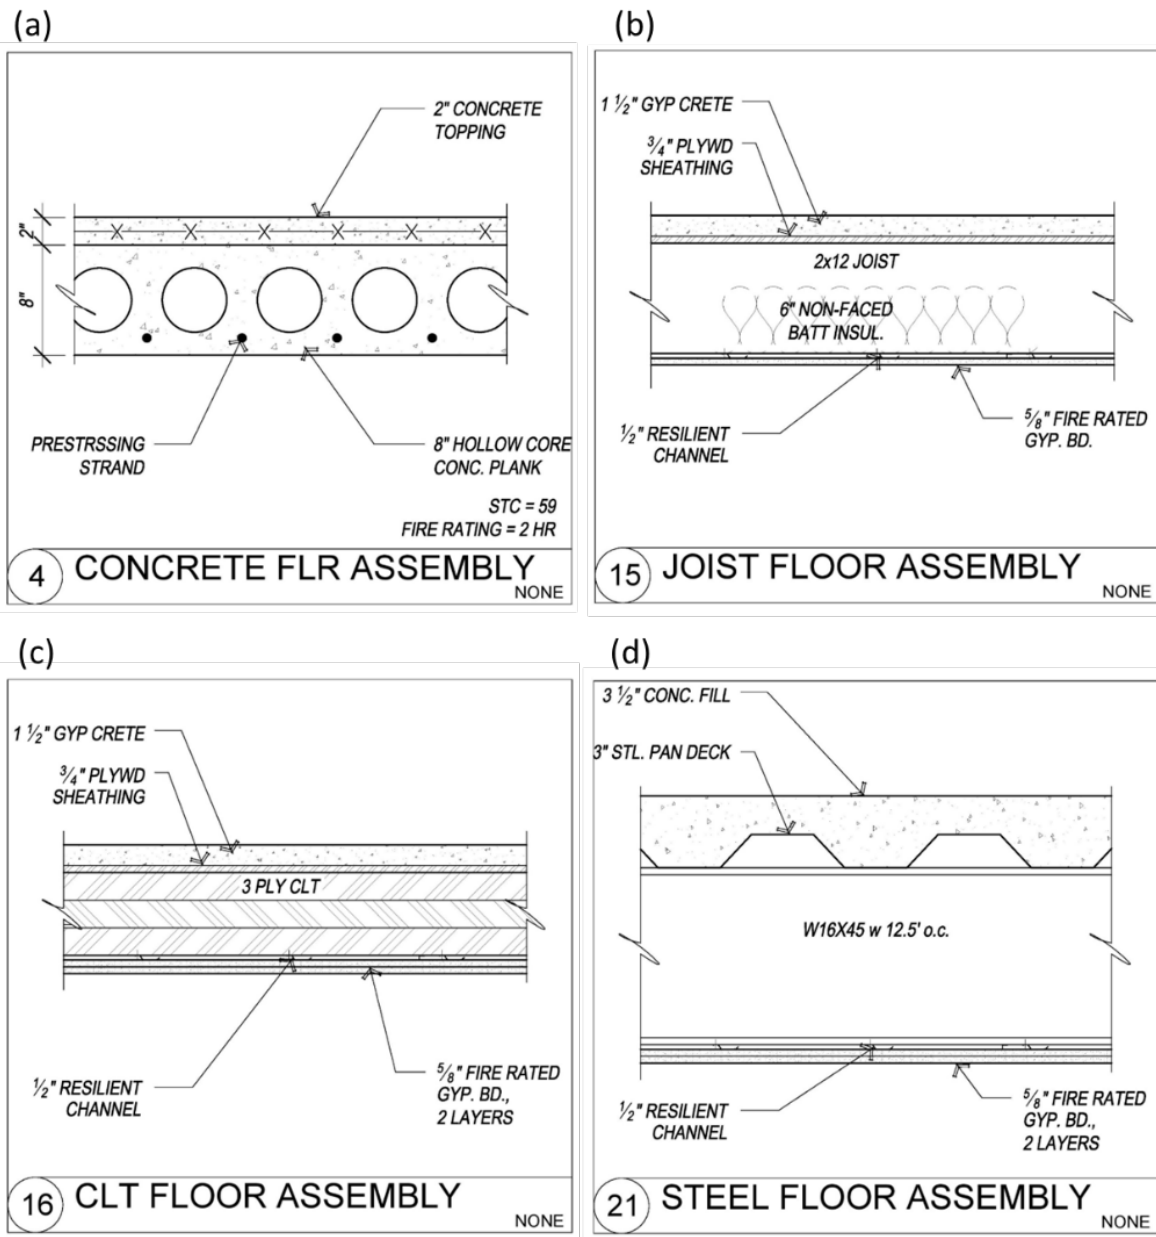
Typical floor assemblies (a) ICF, (b) traditional wood, (c) CLT, (d) steel frame
